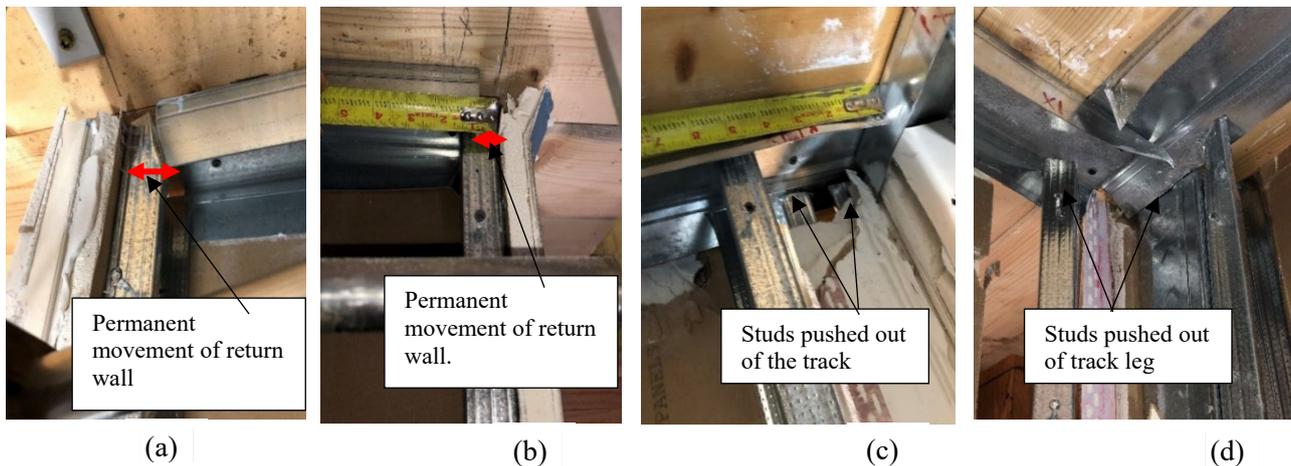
Phase 2 post-test inspections of the distributed gap wall: (a) permanent movement of the return wall (fire-rated wall intersection); (b) permanent movement of return wall (non-fire rated wall intersection); (c) track opening in the return wall and pushing out of studs (fire-rated wall intersection) (d) track opening, and pushing out of studs (non-fire rated wall intersection)
